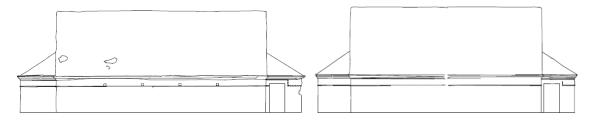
West Side Elevation (Left) East Side Elevation (Right) (Source: WCLA)
